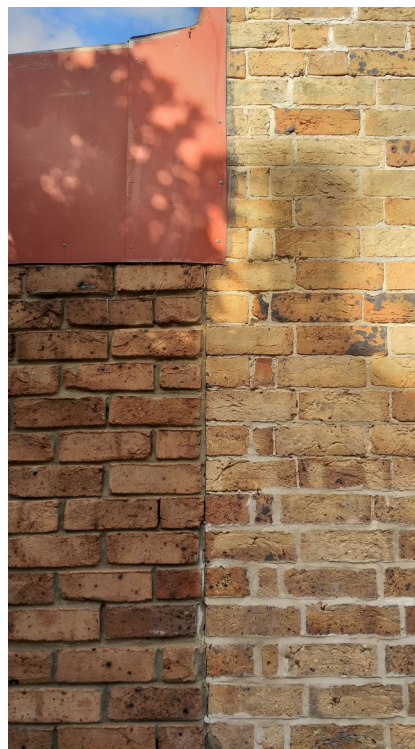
View of two types of bricks used for construction of terrace house (left) and SBW Stables Theatre (right).
